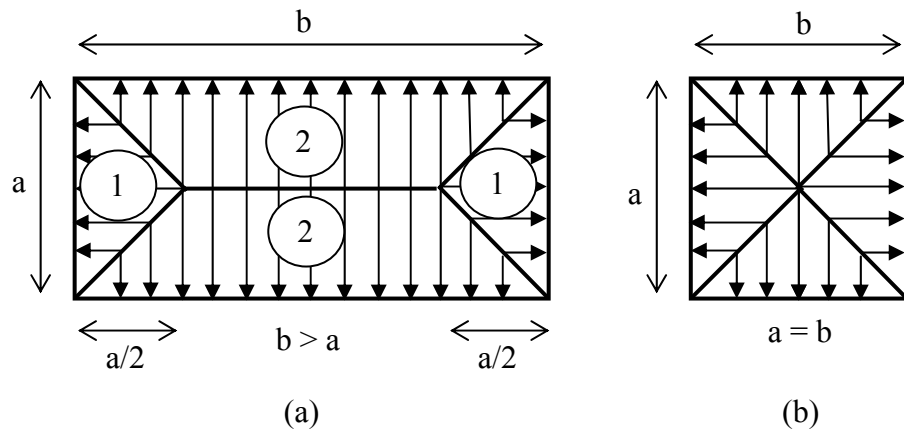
Types of Load Transfer into Surrounding Beams
